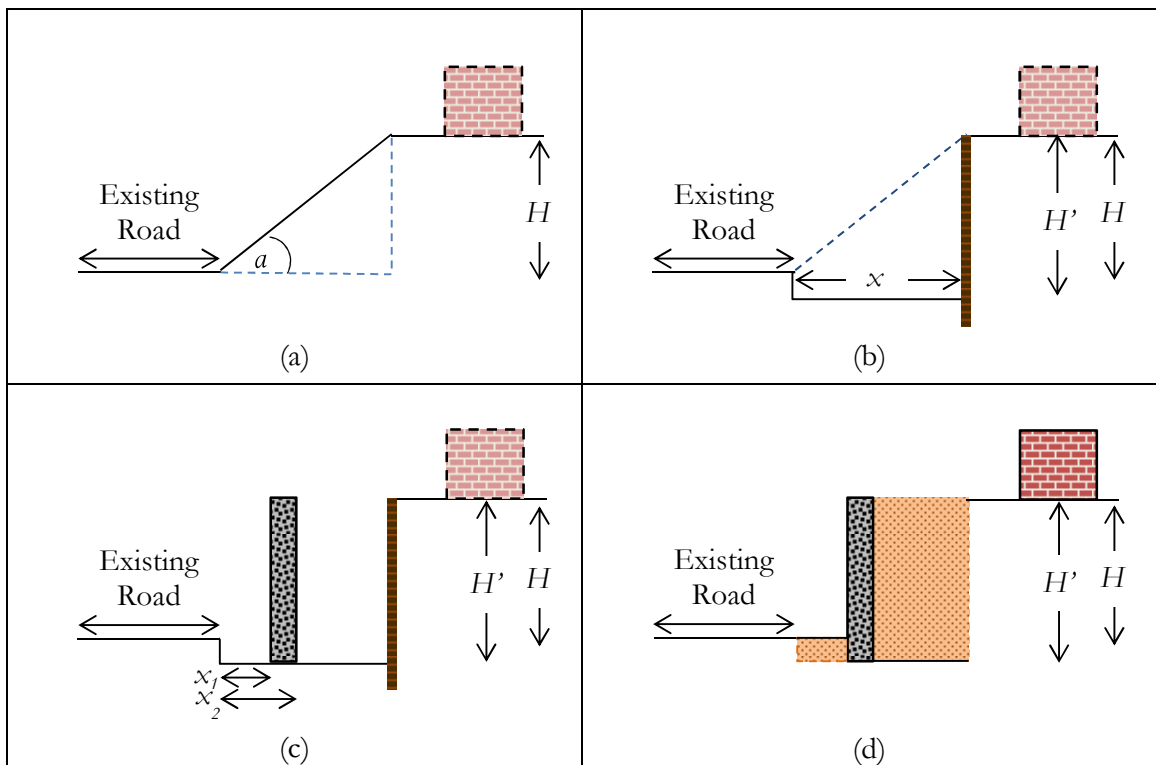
The retaining wall excavation illustrated in four stages: (a) prior to excavation, (b) excavation completed with temporary shoring, (c) wall constructed, and (d) temporary shoring removed and backfill placed.
